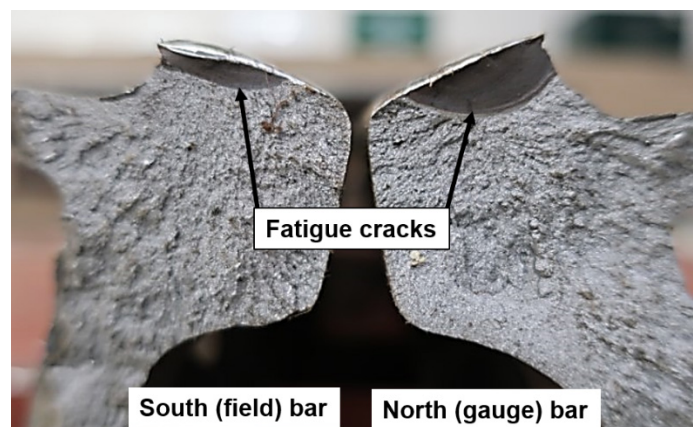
Close-up view of broken joint D, showing the joint bar fatigue cracks (Source: TSB)
